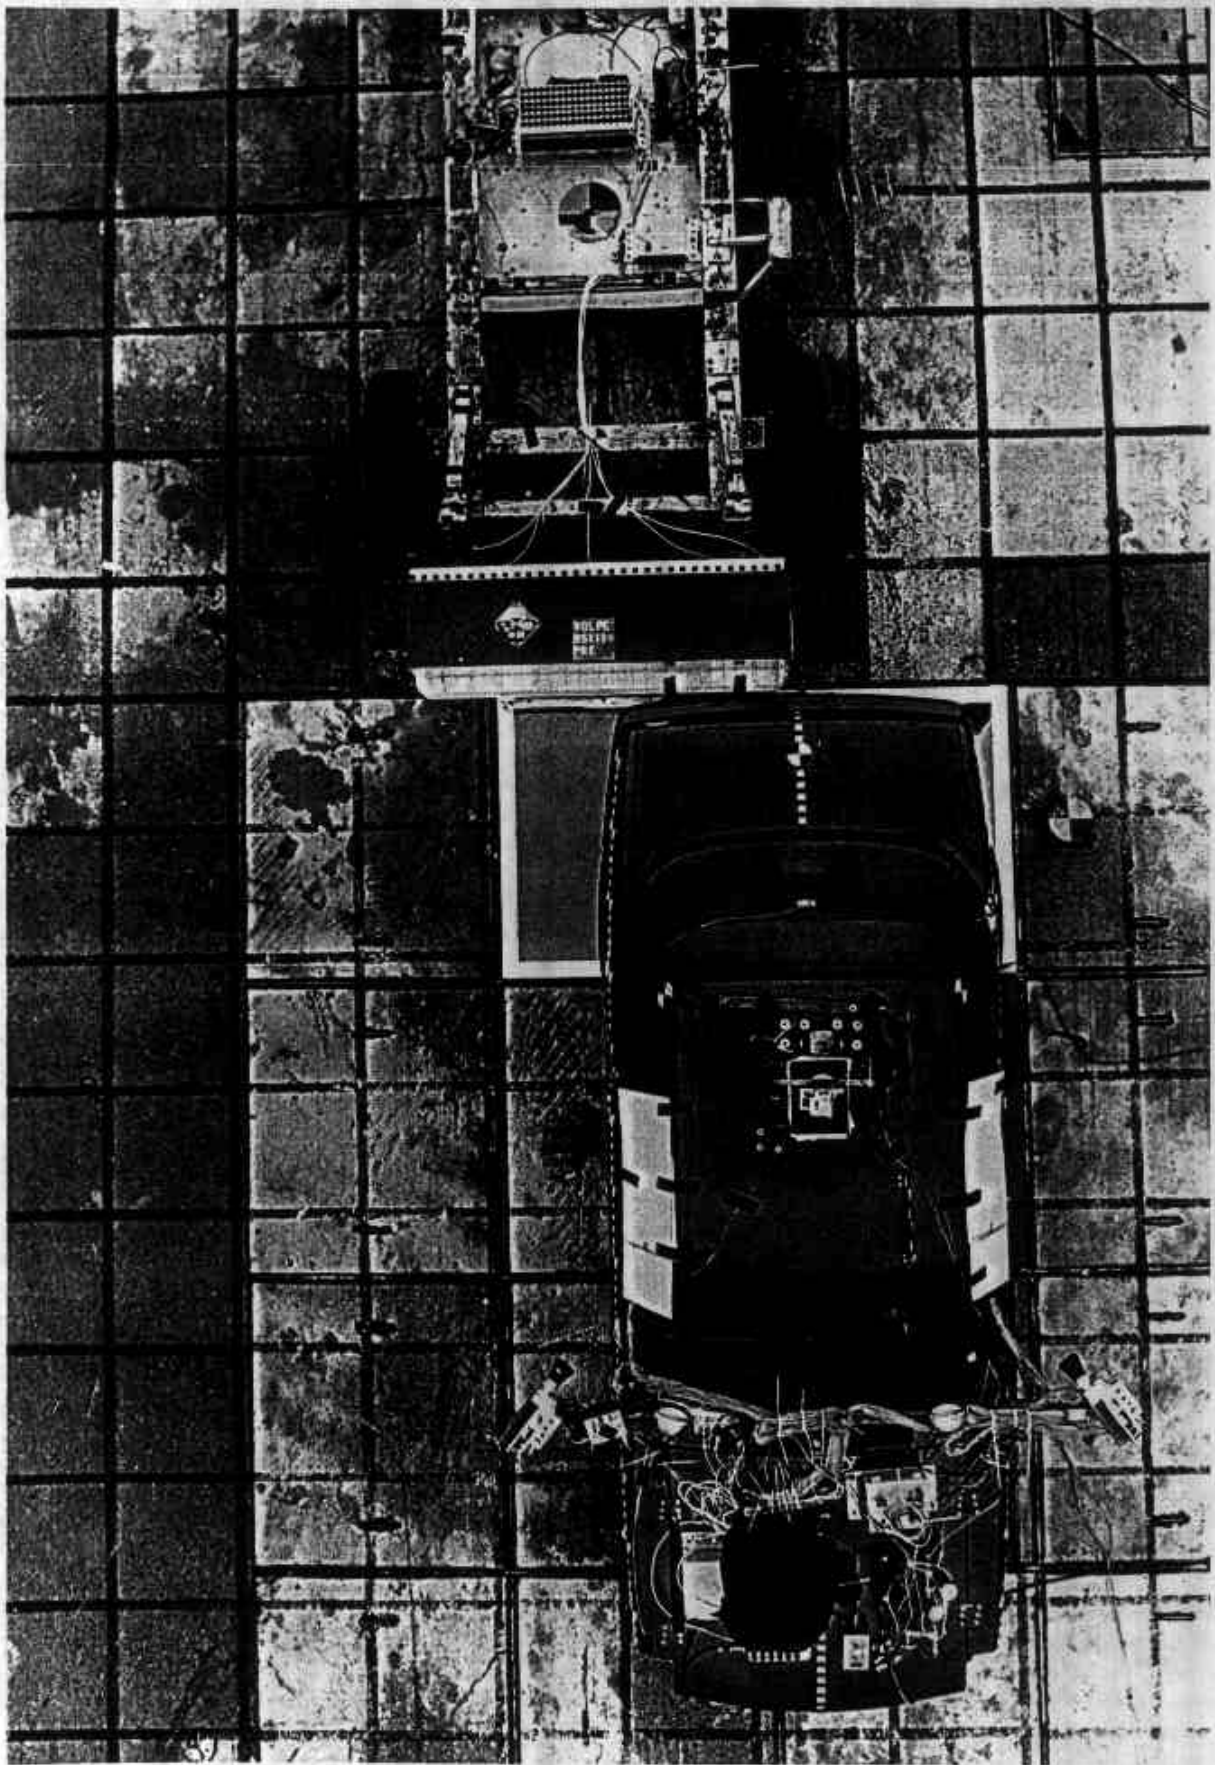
Pre-Test Barrier to Vehicle Alignment View - Overhead
